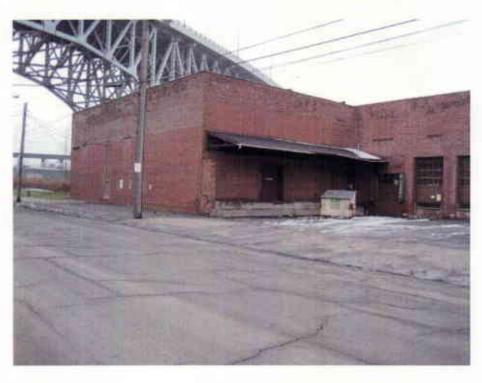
View Looking West at the East Side of The White Properties Building 1996 West 3rd Street, Cleveland, Ohio (CCG1 Design PID 77332)
